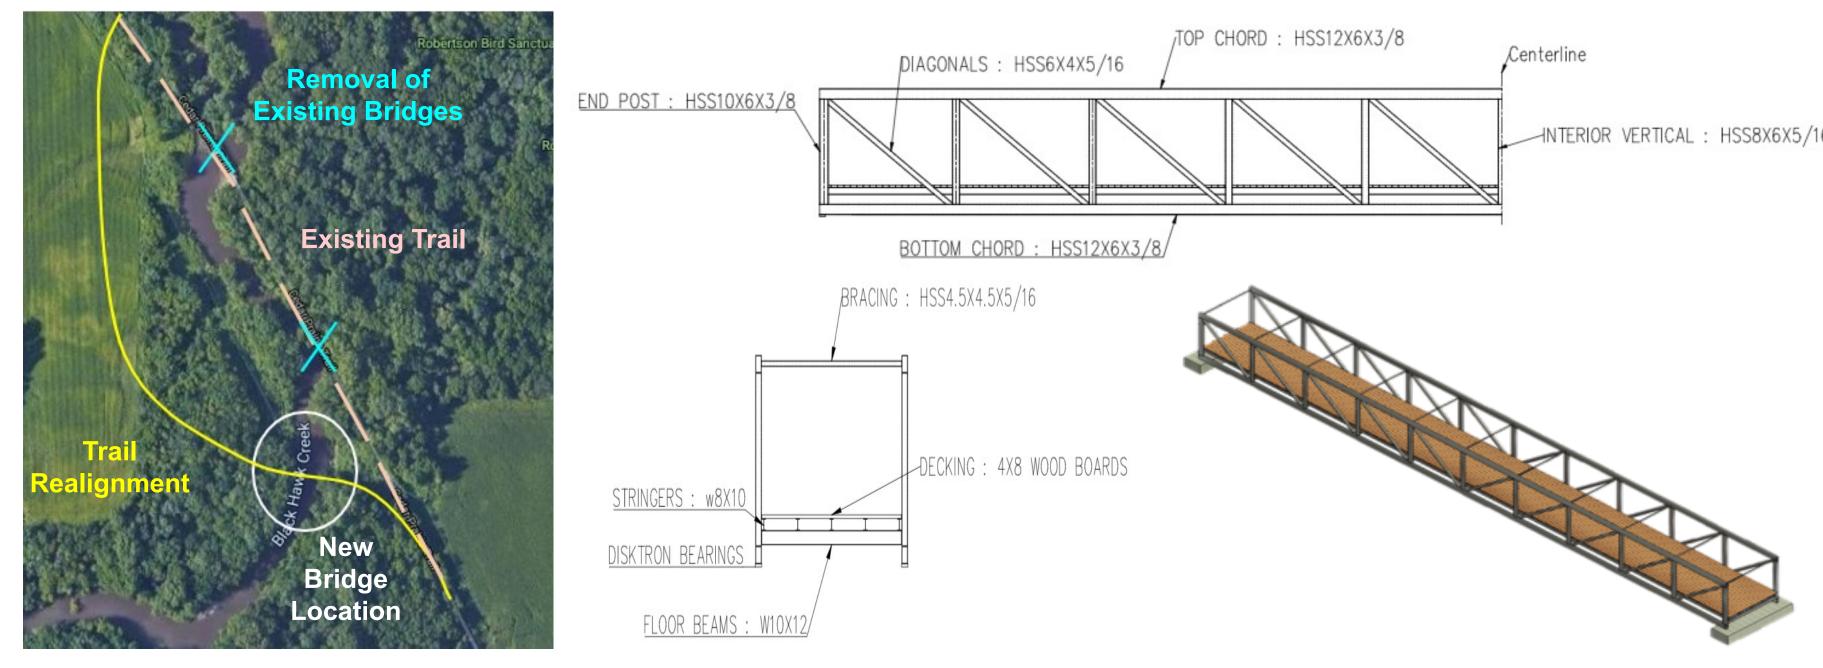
Design plan for Western Bridge Alternative including the alignment and bridge design.
